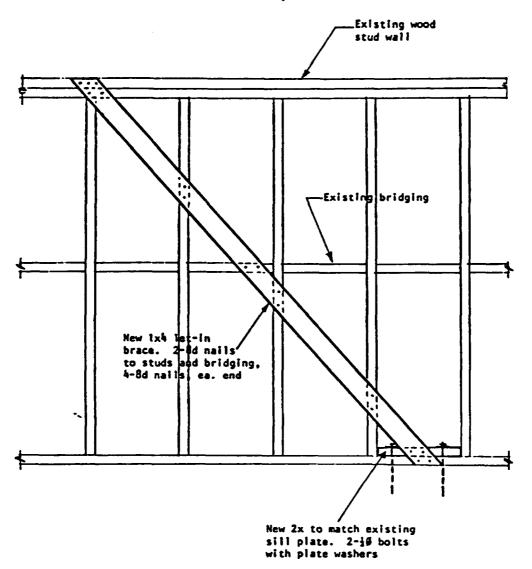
Strengthening existing wood stud walls with let-in bracing
